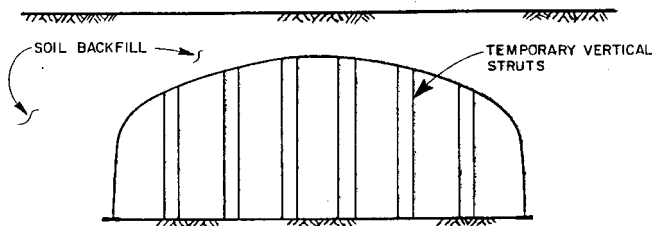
P-1 - Corrugated Metal Culvert with Temporary Vertical Tension Struts
